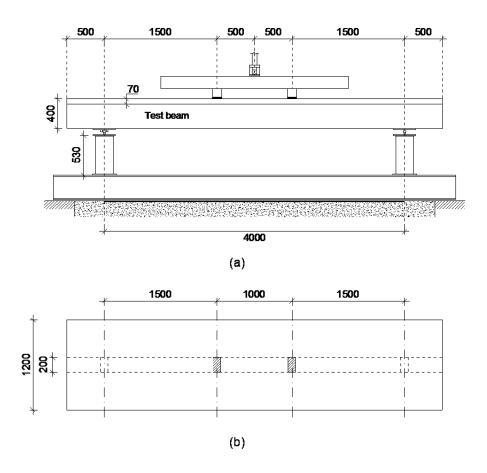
Loading configuration: (a) Front view, (b) Plan view. Units: mm.
